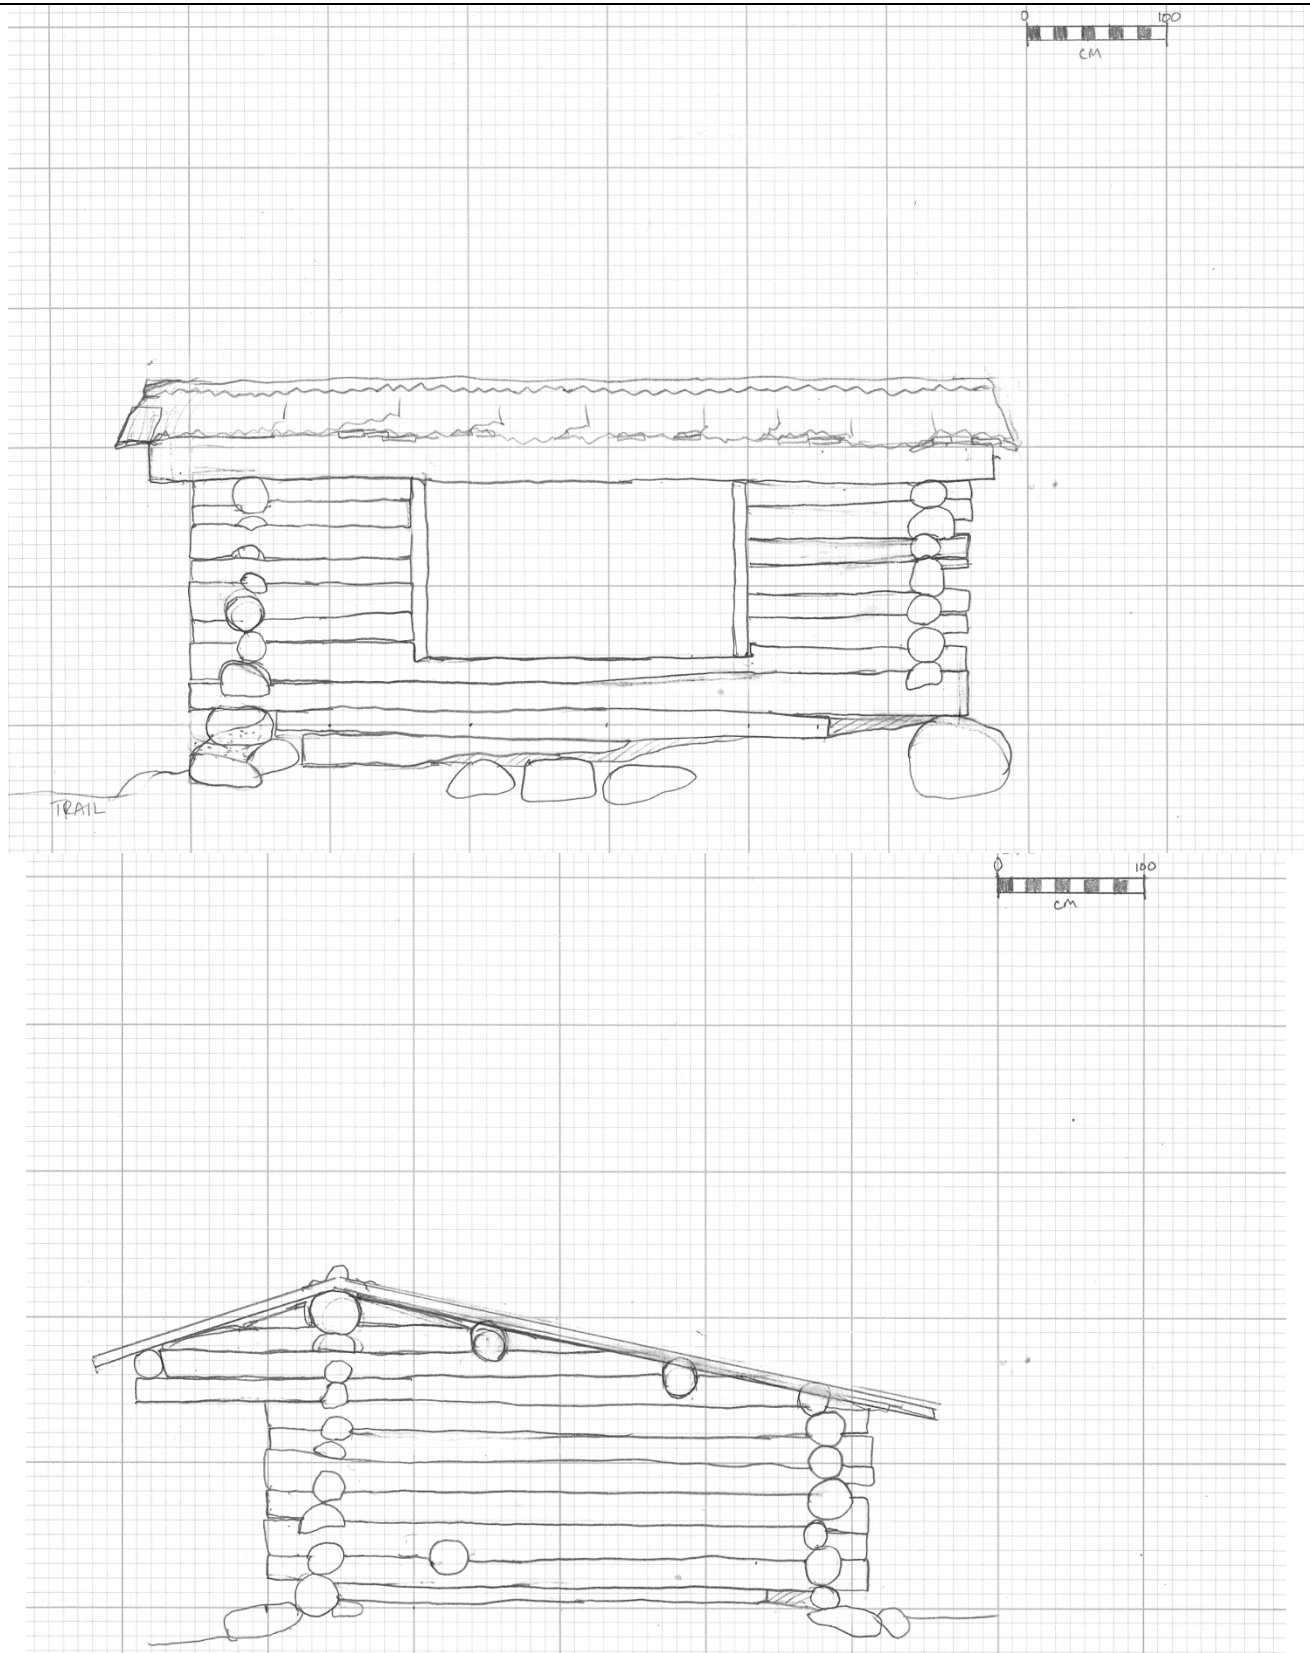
Perkins Notch shelter drawings. Above: Southwest (front) elevation. Below: Southeast side elevation. July 27, 2011.
